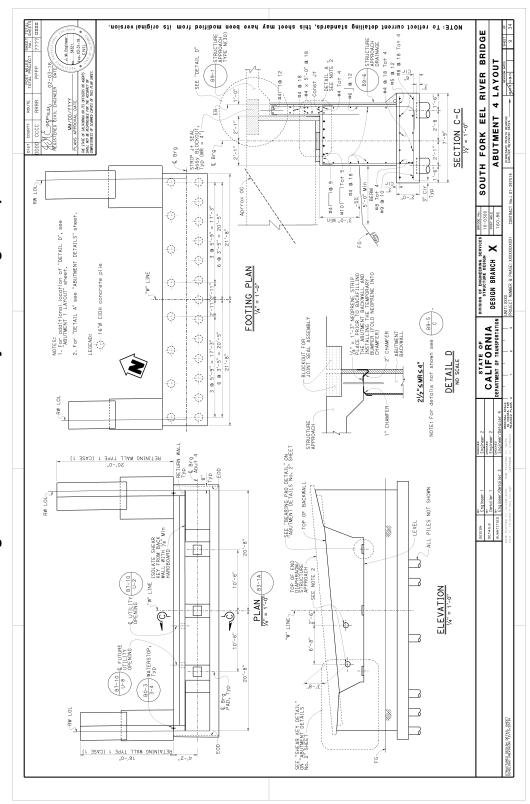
A.A.6 Abutment Layout Detailing Example 6
